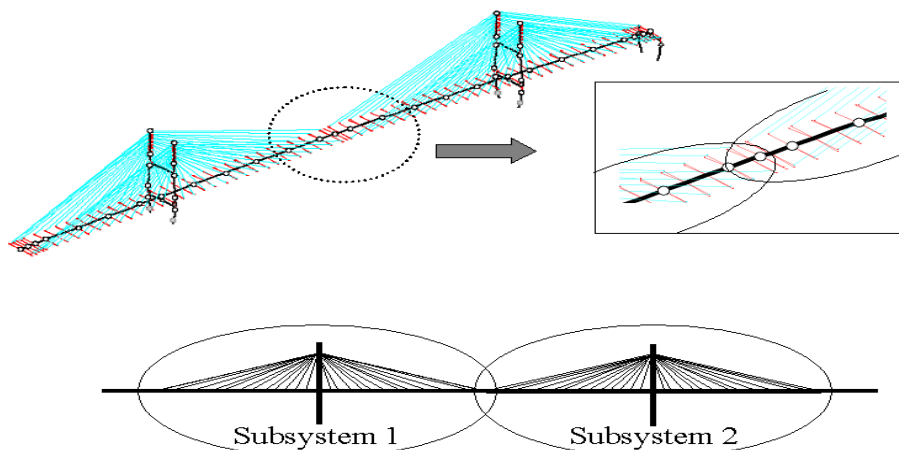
Cape Girardeu Cable-Stayed Bridge
